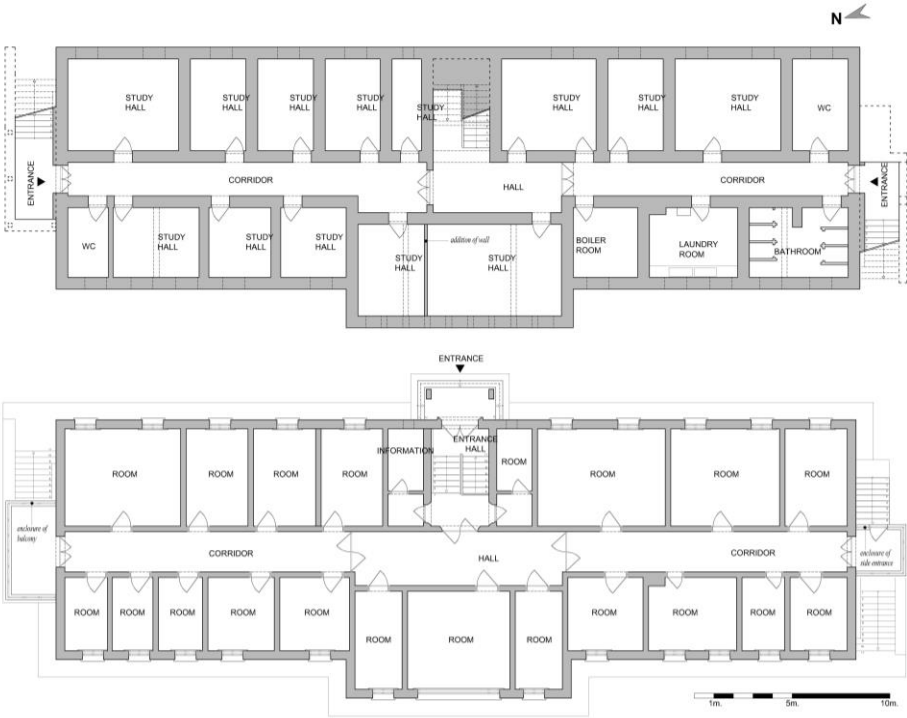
Basement floor and ground floor plans of Girl’s Dormitory
